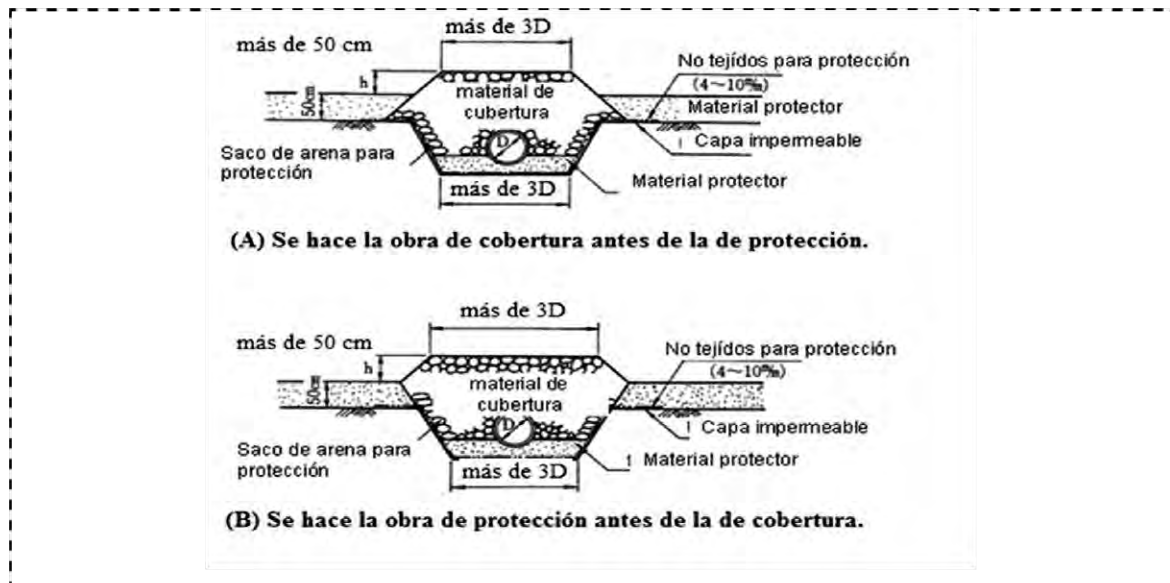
Example of Structure of Leachate Collection and Drainage Pipe Installed at the Landfill Bottom
